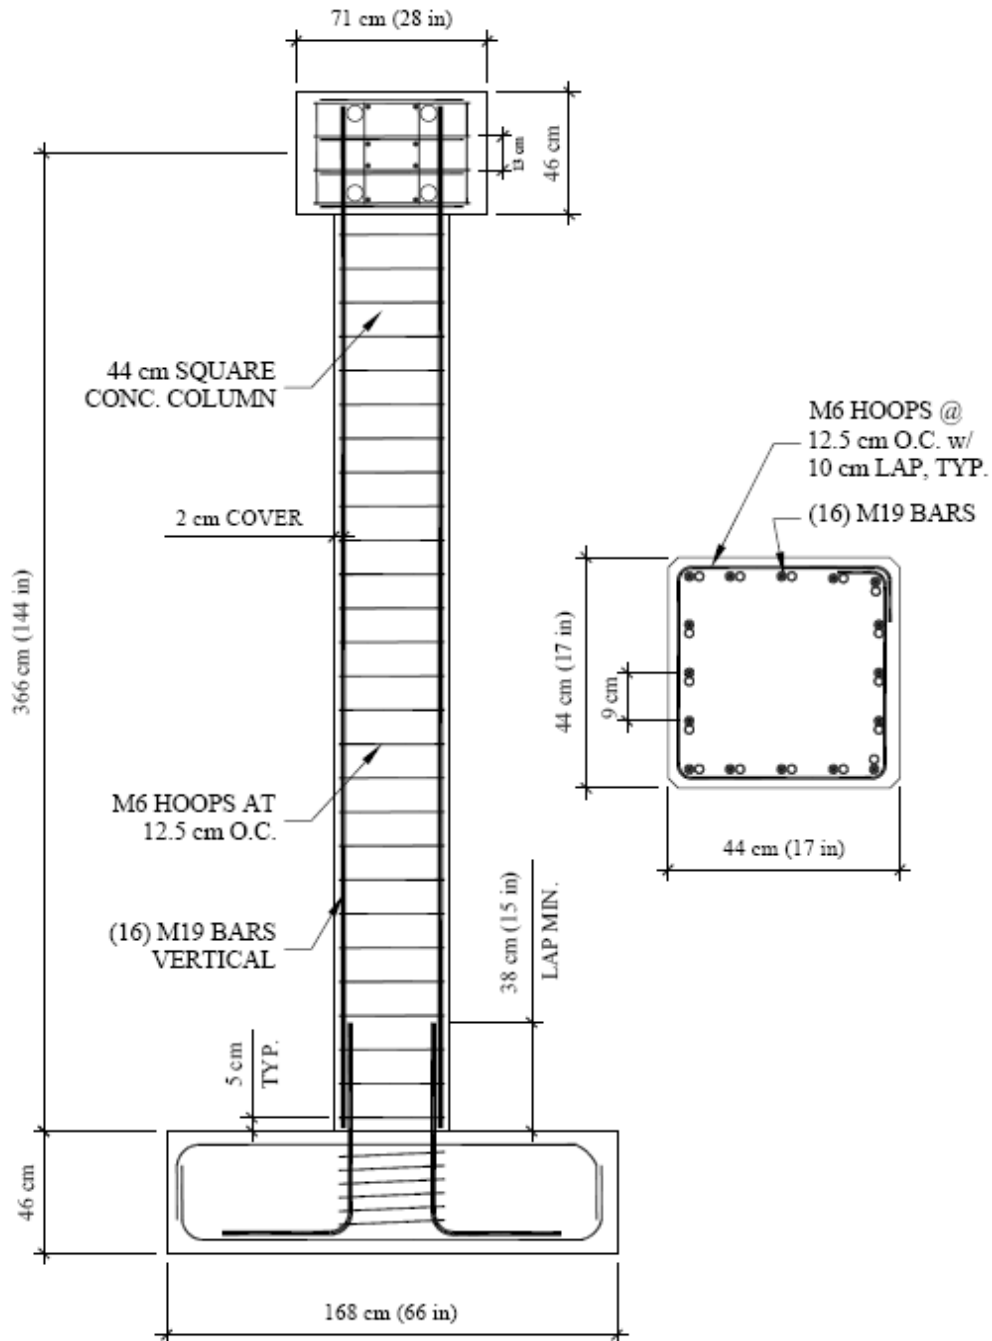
Details of the Square Lap Reinforced Flexure Column Test Specimen
